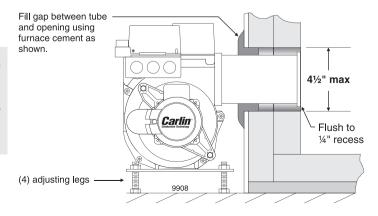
Seal opening around burner air tube when pedestal mounting (burner shown with tube attached to housing and installed)
